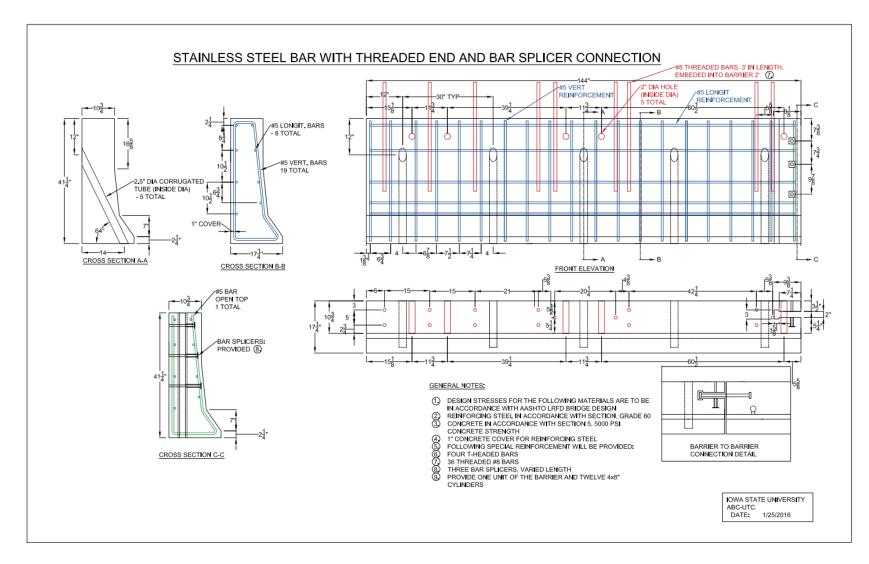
Detailed Prefabricated Barrier Drawings, Dimensions in Inches [2]
